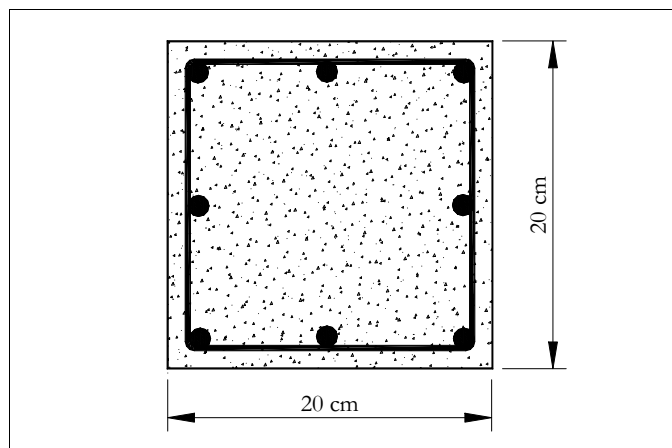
Cross section and arrangement of reinforcement in the columns tested by Queiroga [9]
